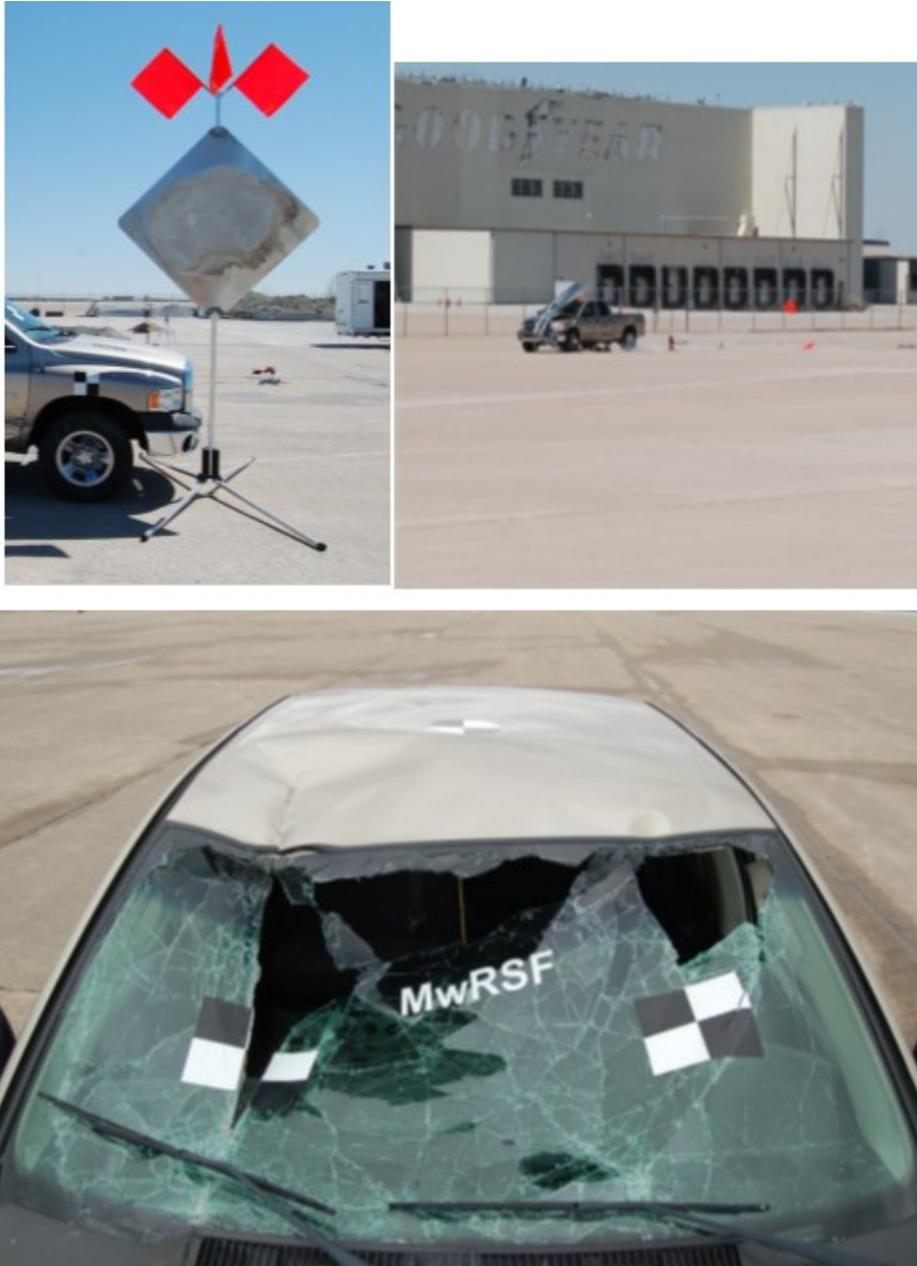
Unsuccessful crash test of a 5-foot temporary sign support (source: Midwest Roadside Safety Facility).
